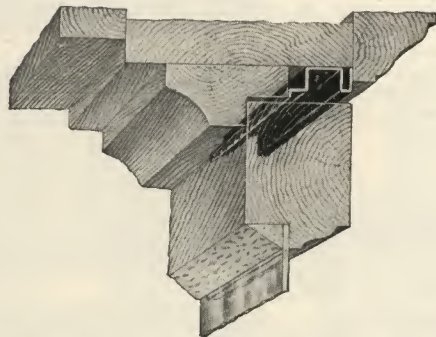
Cross-section through sash and window frame at top showing installation of "AiR-Way" track above sash and tight application of sash.
